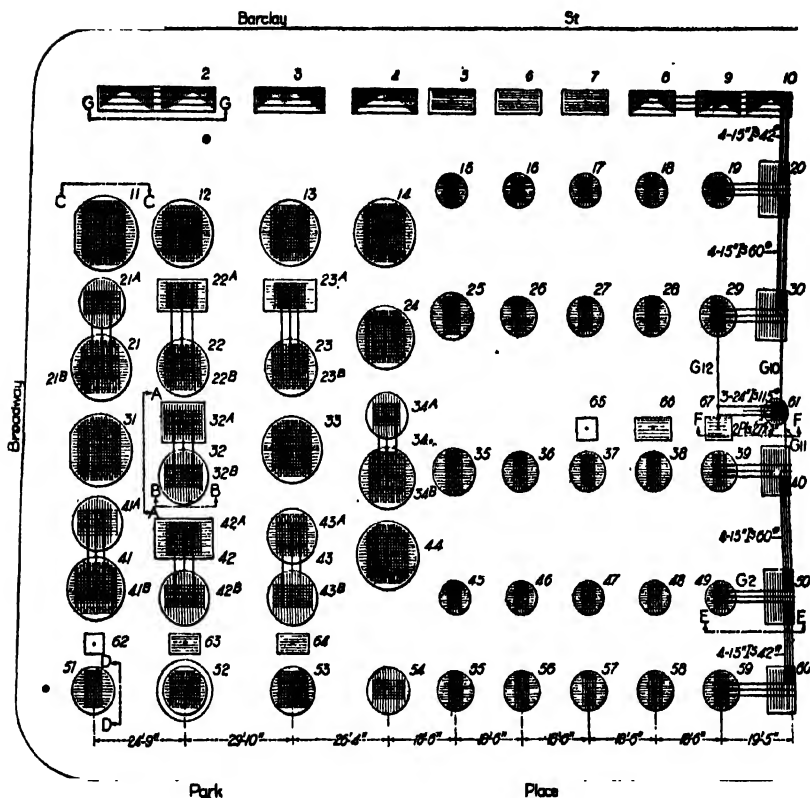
Plan of Piers and Grillages for the Woolworth Building.
